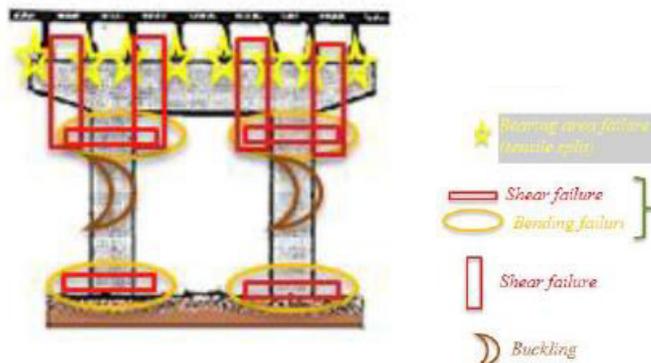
Visualization of vulnerable zones of Piiometsa bridge substructure
